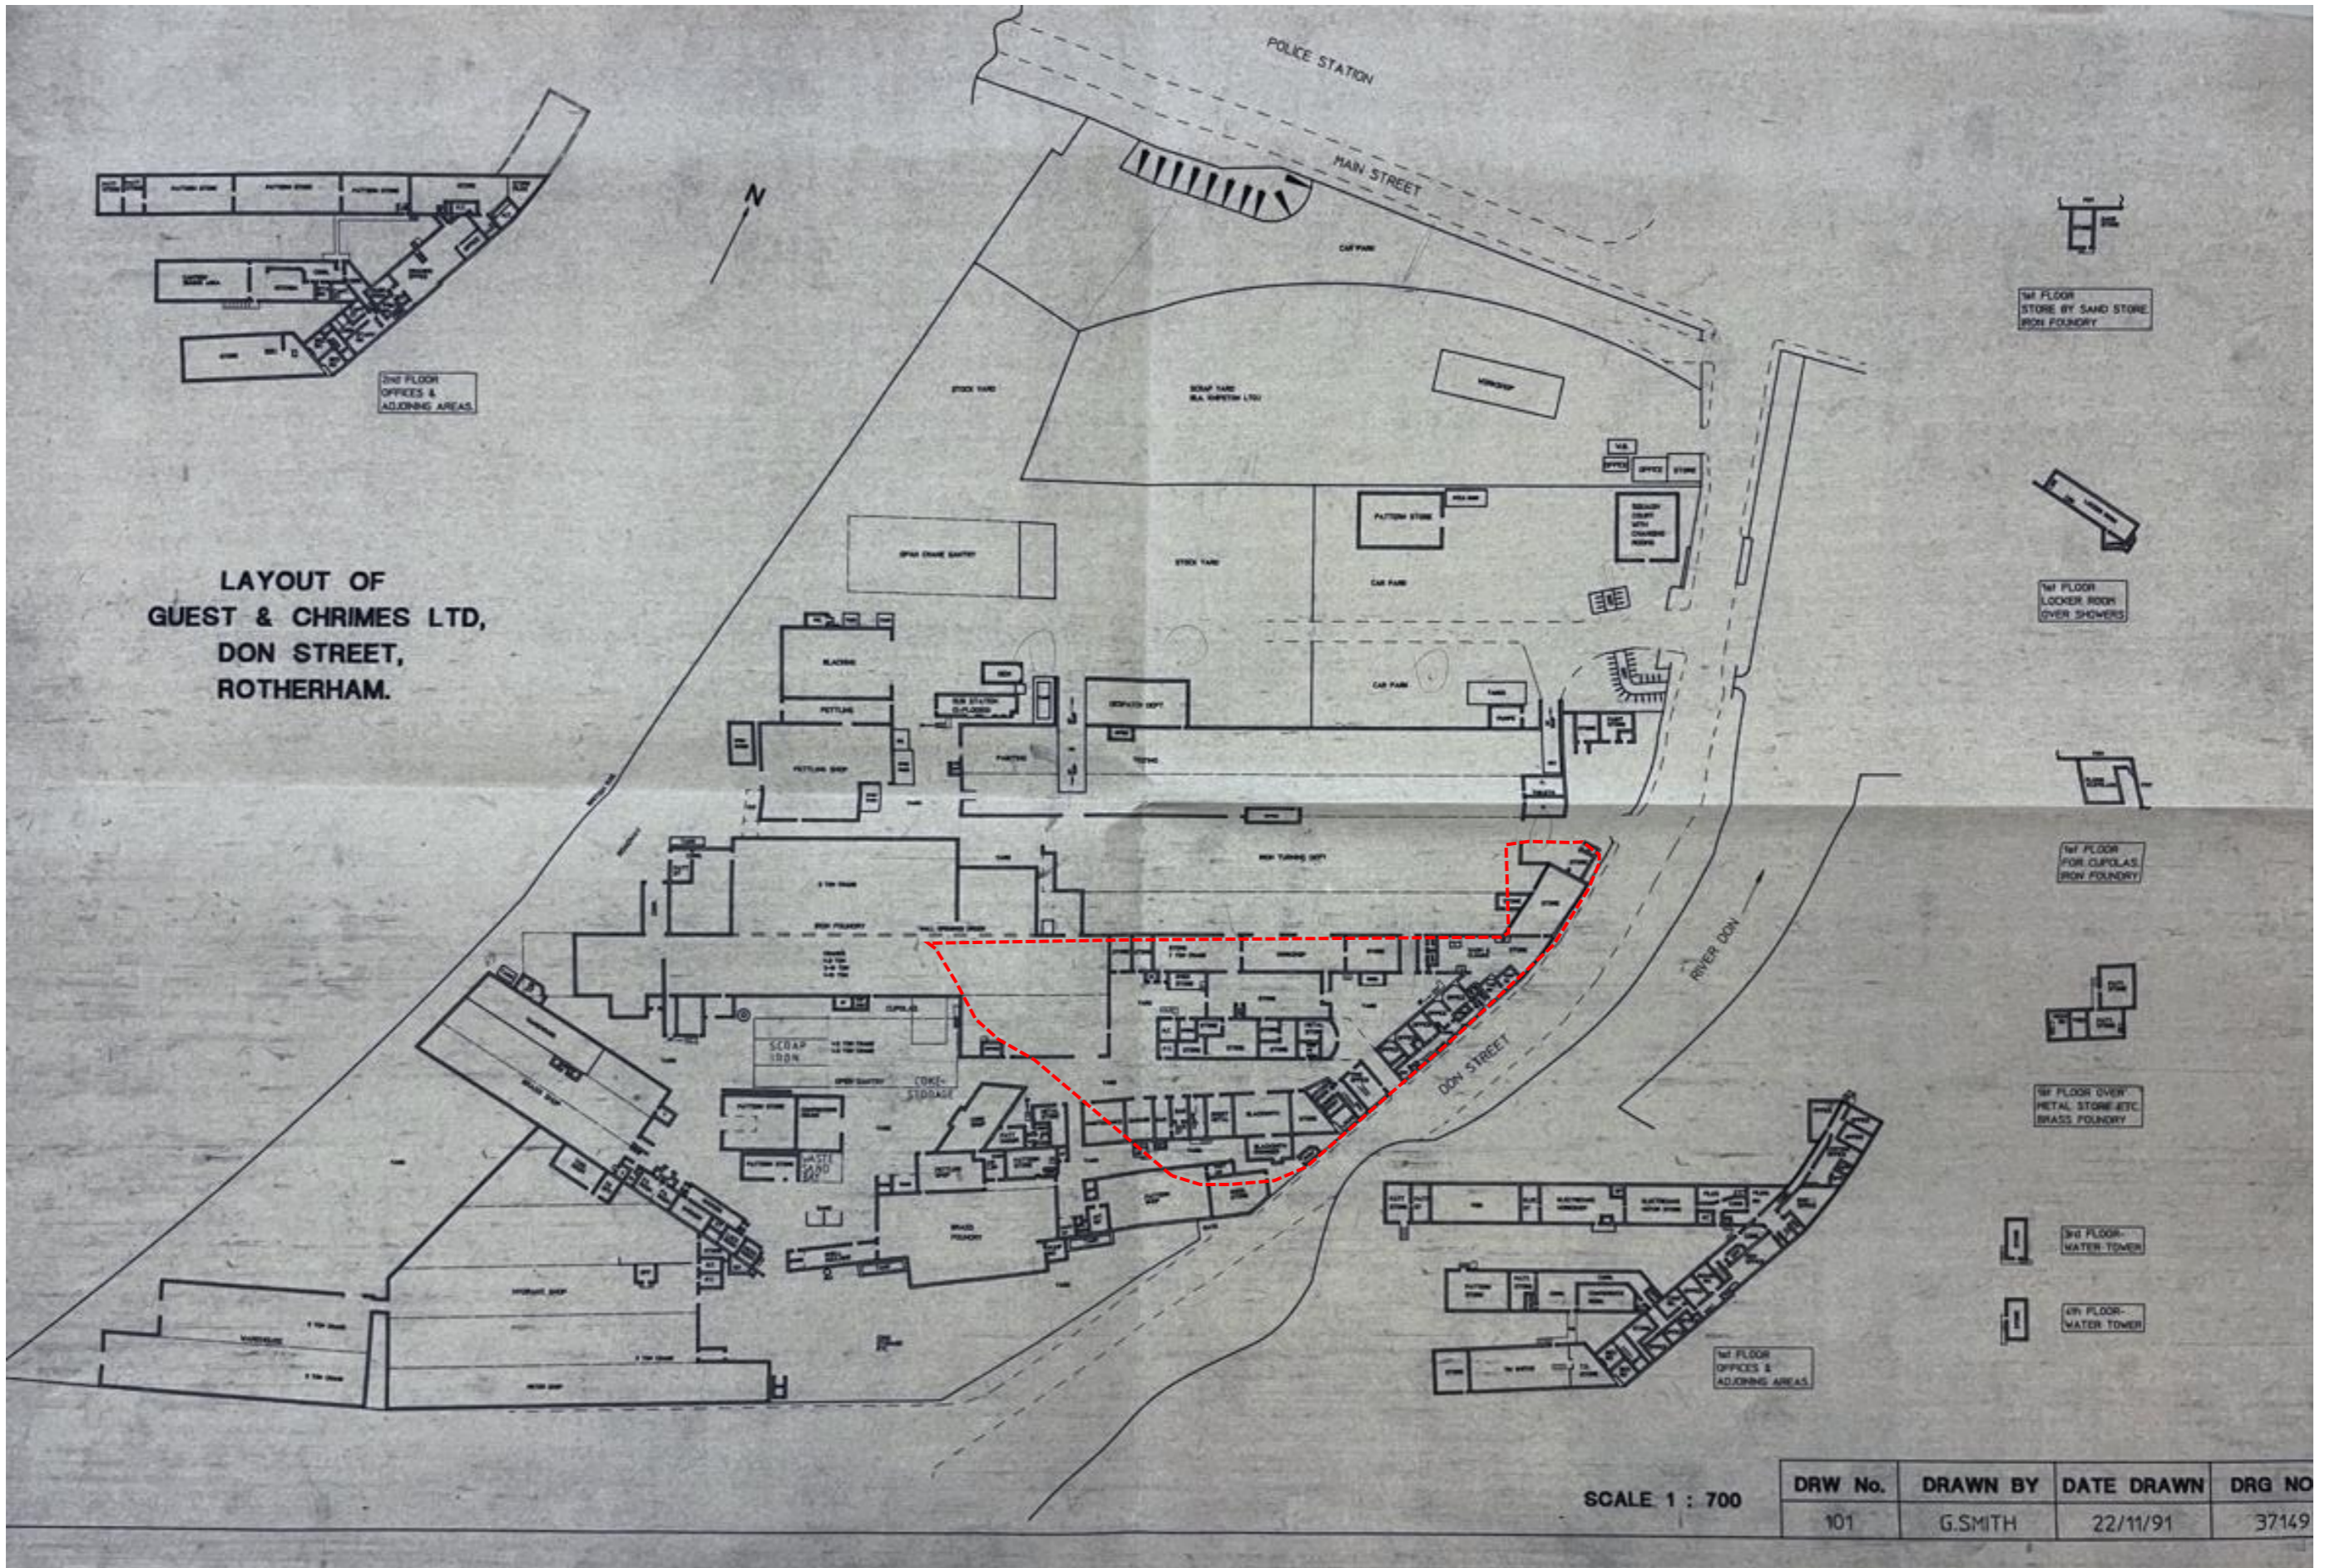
Layout of the wider Guest and Chrimes site, 1991. The subject buildings are indicatively outlined in red to give an impression of the former scale of the site. Source: Rotherham Archives and Local History.
